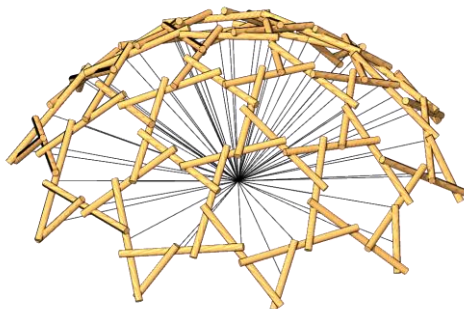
Orienting beams around a predefined point does not always provide usable results
